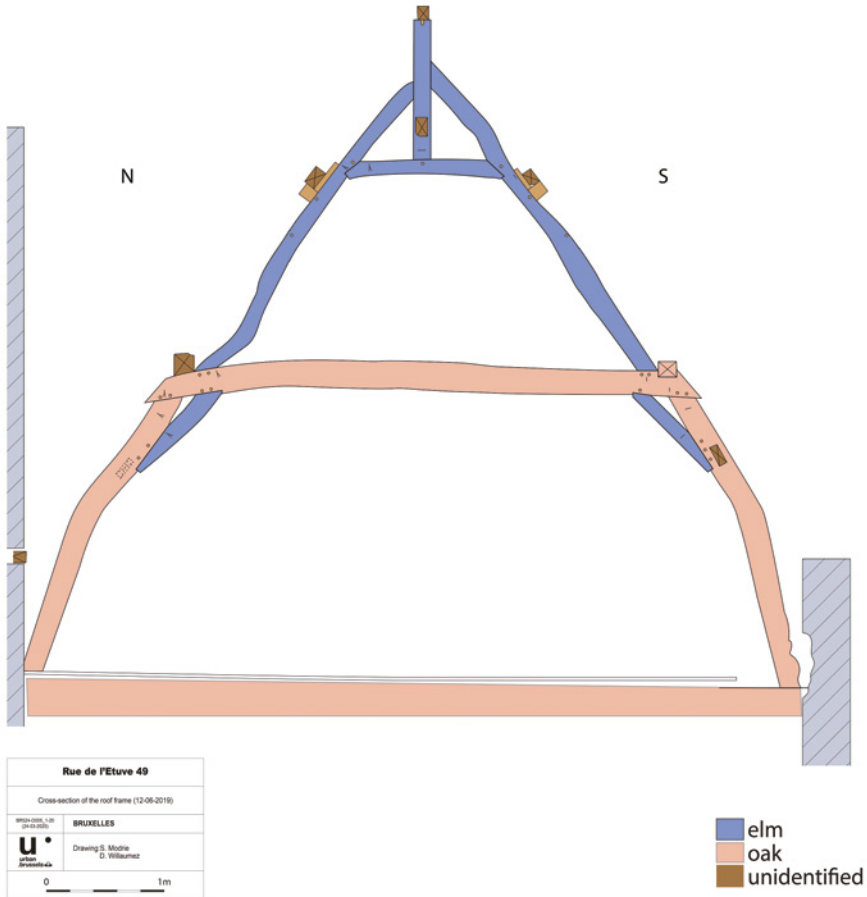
Cross-section of the roof frame in Building B. Distribution of species located on the archaeological survey of the roof trusse 1, rue de l'Étuve 49–51, Brussels
